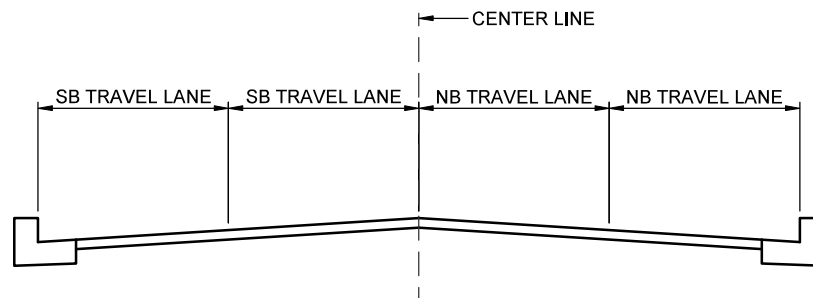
Prospect Typical Section 38th to 63rd_Midtown
